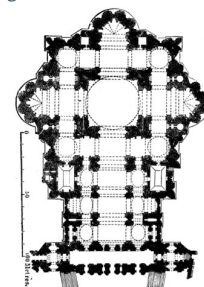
Final floor plan St. Peter's. (Alamy Stock Photo, sd)
